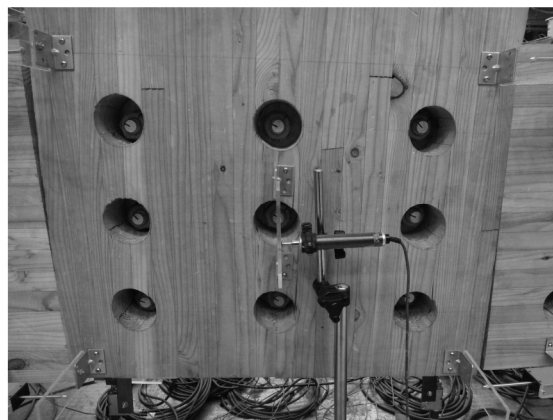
Shear cracks at pre-drilled hole periphery
